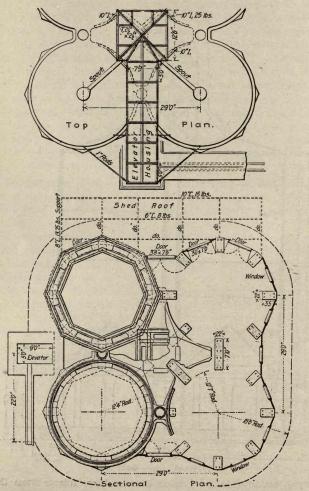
Plan of Cement Storage Bins, Illinois Steel Co., Chicago.
